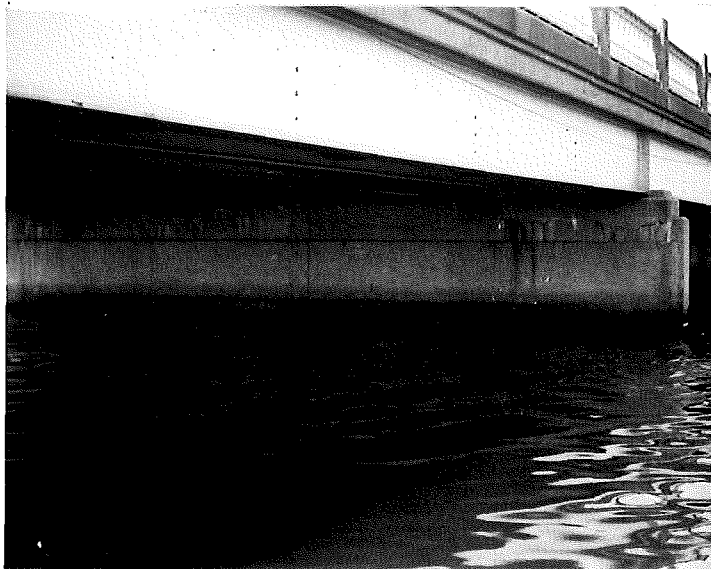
MORE ADVANCED DETERIORATION IN SOUTH END OF FIRST PIER FROM WEST END OF BRIDGE DUE TO FREEZE AND THAW ACTION.
